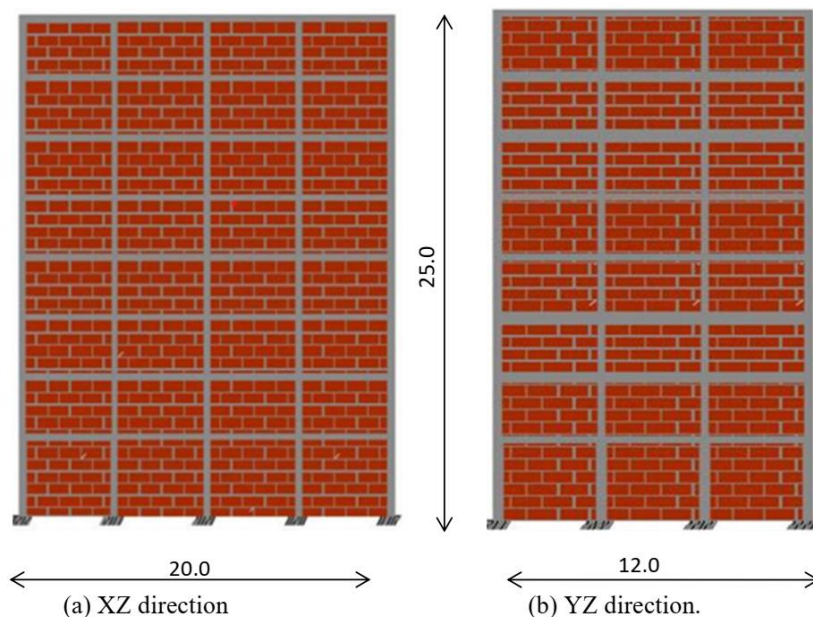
R+7 structure with full-height masonry infill: (a) XZ direction; (b) YZ direction.
